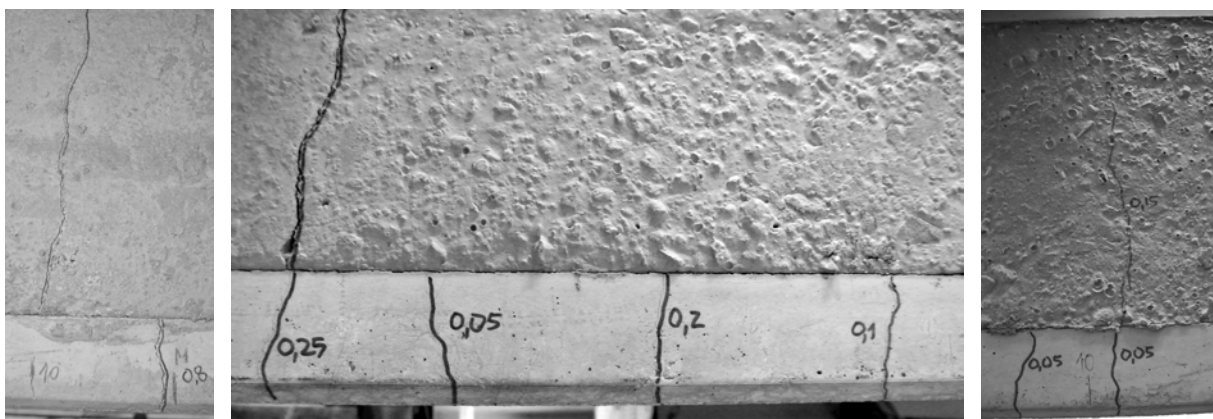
Differing crack distribution in double wall element panels and the in-situ concrete
